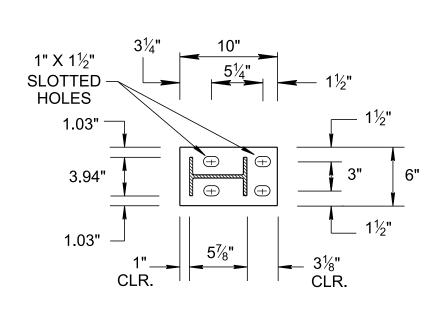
DETAIL FOR CONCRETE DECK WITH 6" TO 1'-0" OF ROADWAY FILL COVER
